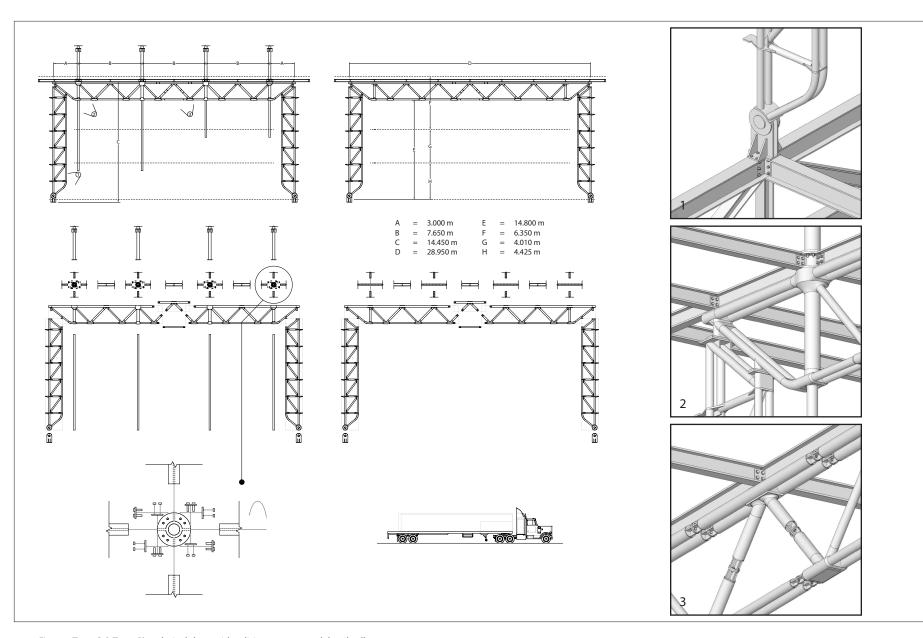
Truss-B & Truss-Bⁱ, technical sheet with splicing strategy and detail callouts
